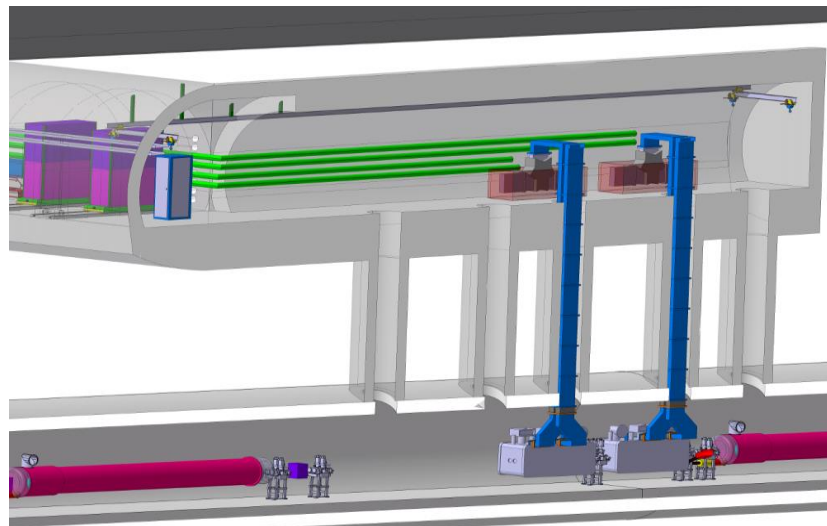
Preliminary sketch of a high-power RF, controls and LLRF layout in the underground RF cavern.
